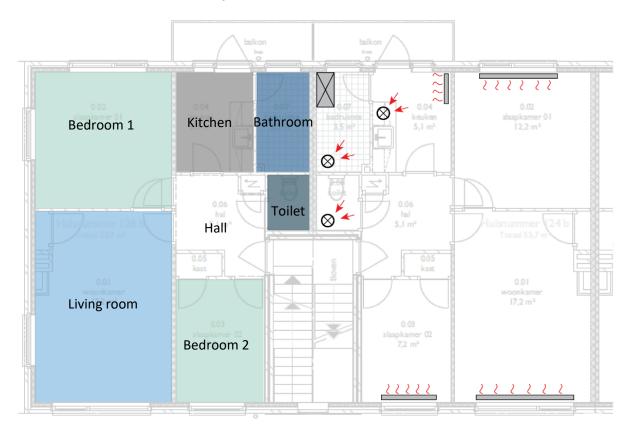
Floor plan Soendalaan with the location of delivery equipment. Adapted from (KAW, 2017, DO-02\_b)
